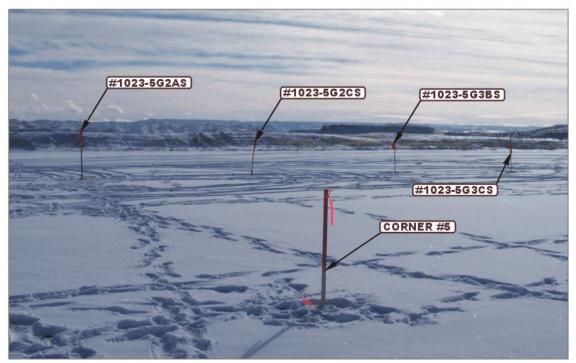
PHOTO: VIEW FROM CORNER #5 TO LOCATION STAKE
